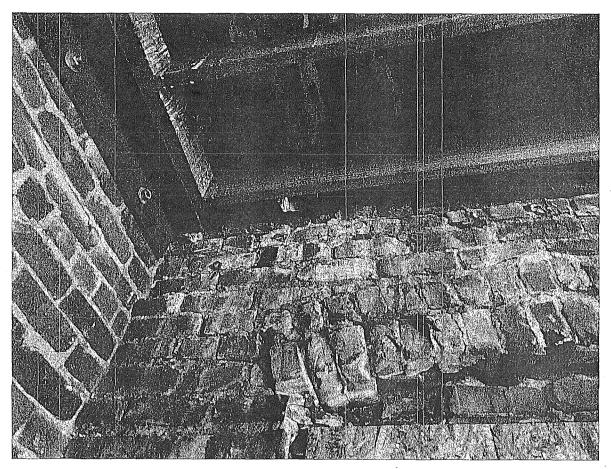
Detail photograph of deteriorated brick mortar joints and efflorescence above southernmost window opening at fifth level. Note rust stains surrounding metal embedments and water stains at underside of roof sheathing (photograph taken on 02/27/2018).
